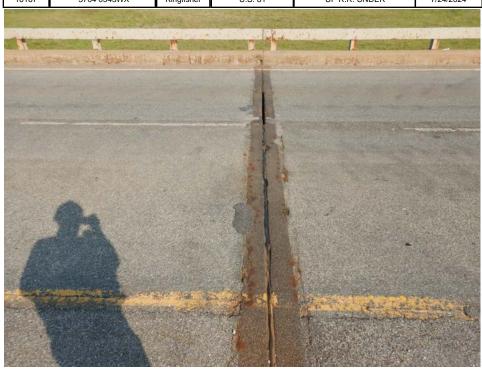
Looking north along the expansion joint over pier 1. Note: asphalt and concrete patches exist along the joint.
